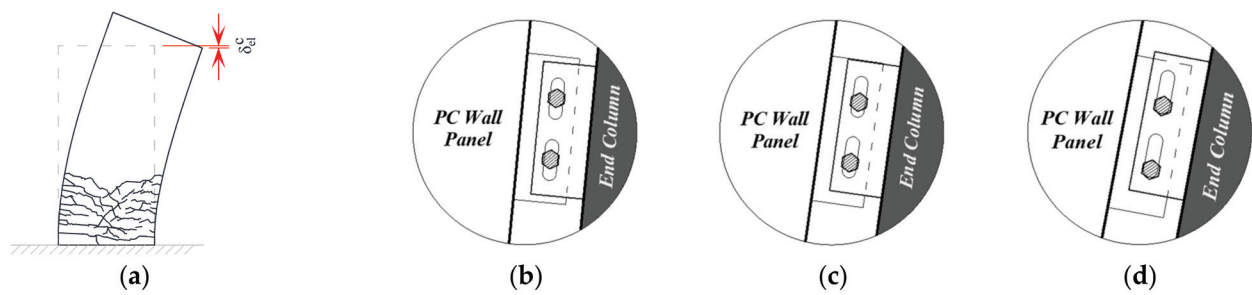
Vertical bearing of Compressive side (VC). (a) Longitudinal elongation of compressive side; (b) Before slip; (c) Slipping; (d) Bolt bearing.
